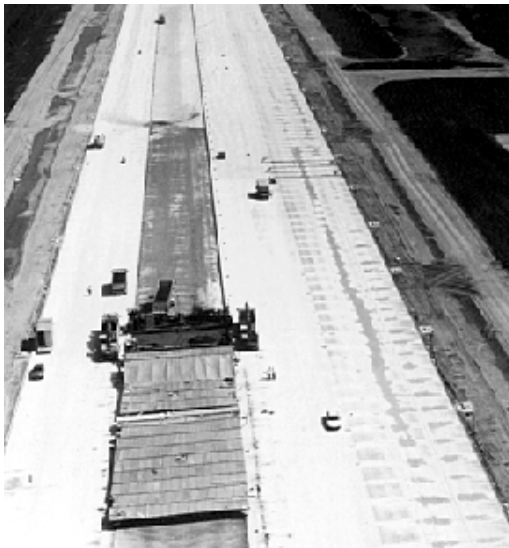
Construction of the concrete pavement for the runway in two layers in slipform technology; tents were only dragged behind the paving train during the first days of concrete placement
